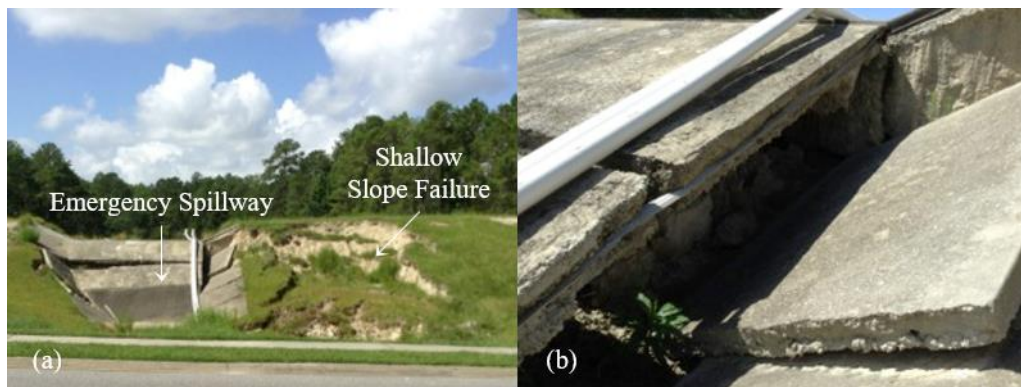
Failure of Dam D: (a) shallow slope failure in the downstream side slope and damage to the emergency spillway (southwest view from Legion Drive), and (b) close up view of voids under concrete slabs due to erosion below the slabs.
